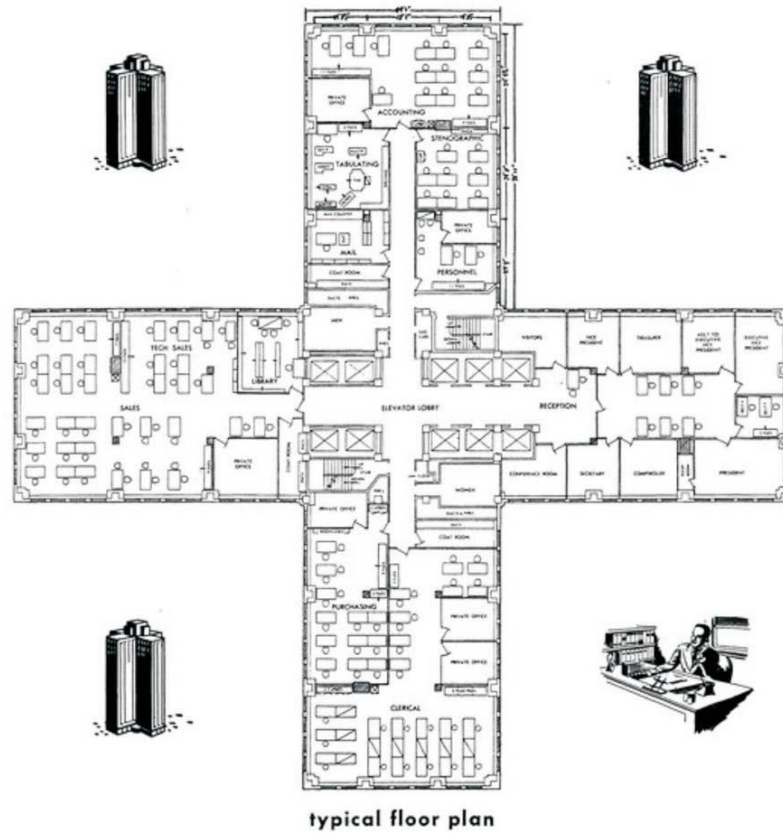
A typical floor plan from One, Two, or Three Gateway Center, showing the central elevator core and double-loaded office corridors (The Charette 1951:11).
